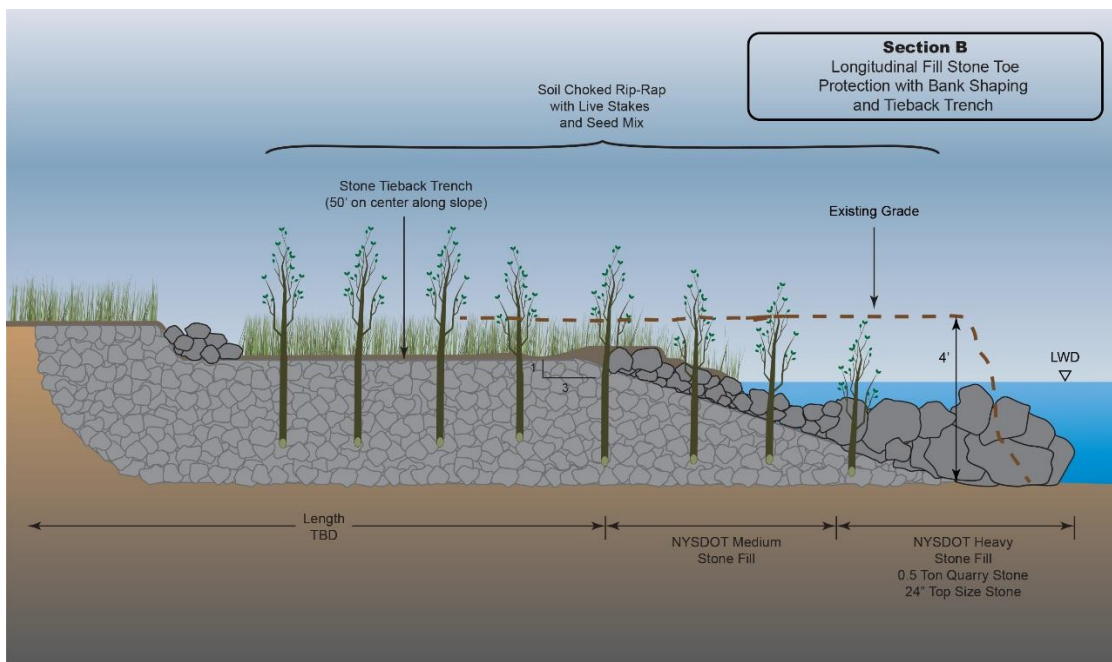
General Cross Section B - Longitudinal Fill Stone Toe Protection Tieback Trench (Reach 1)
